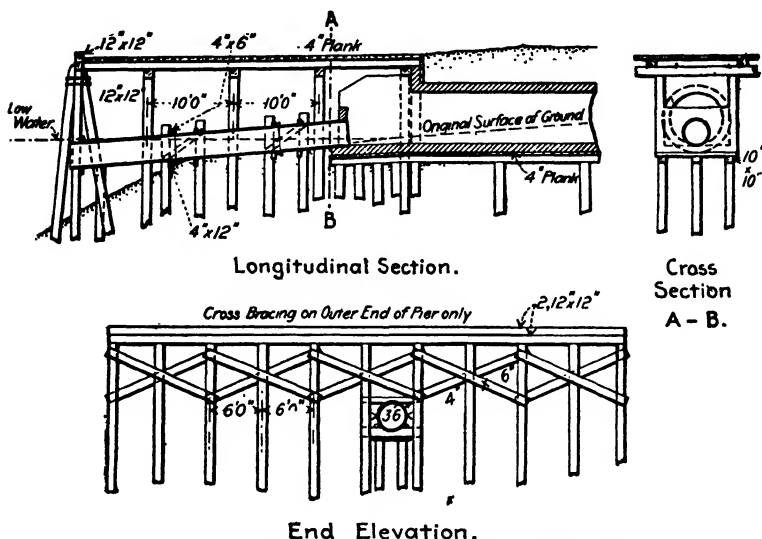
Outlet of joint trunk sewer, New Jersey.
